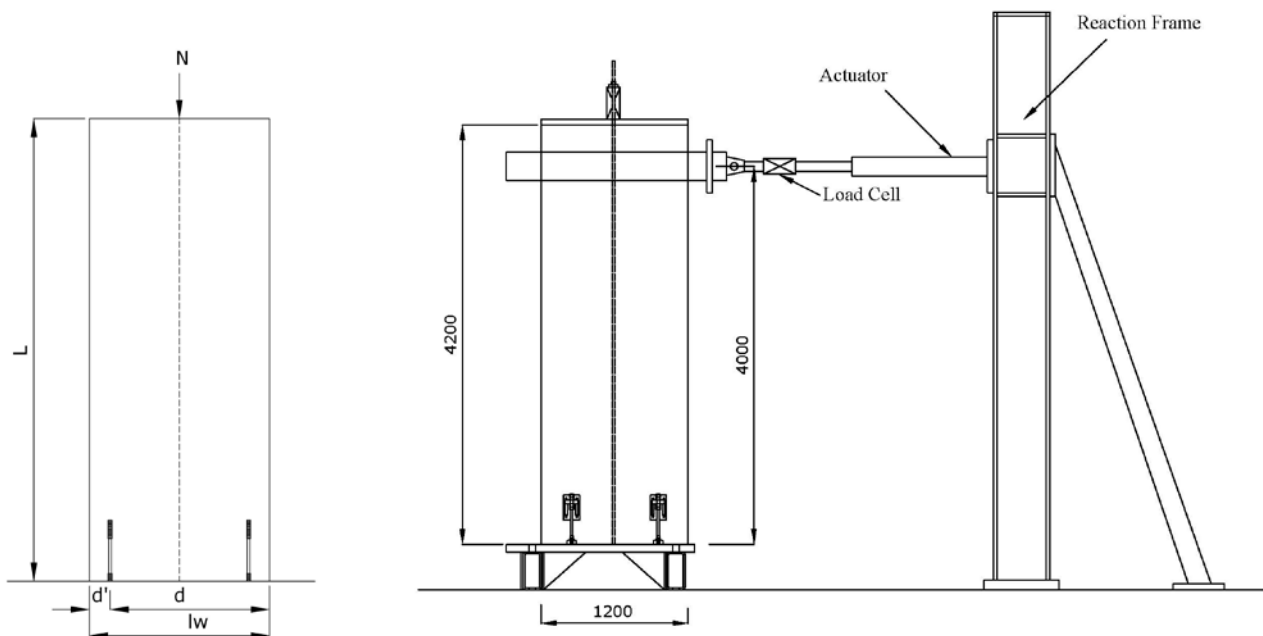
CLT Wall panel and wall-foundation test specimen
